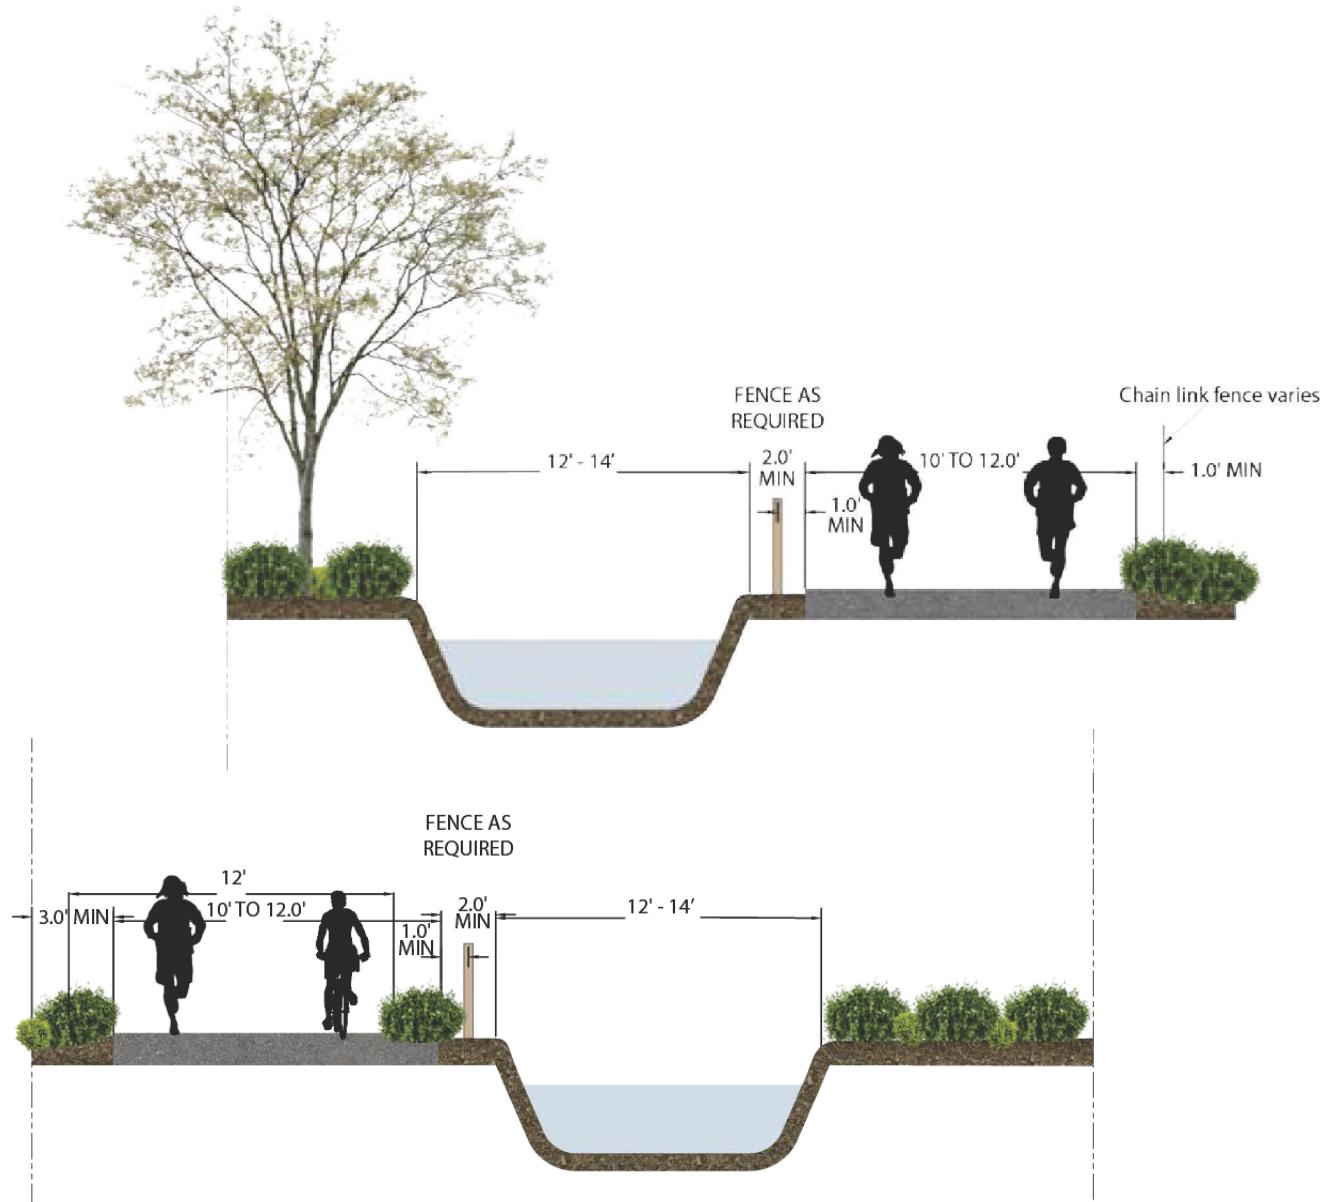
East Jordan Canal Trail typical sections of trail on left or right side of canal.
